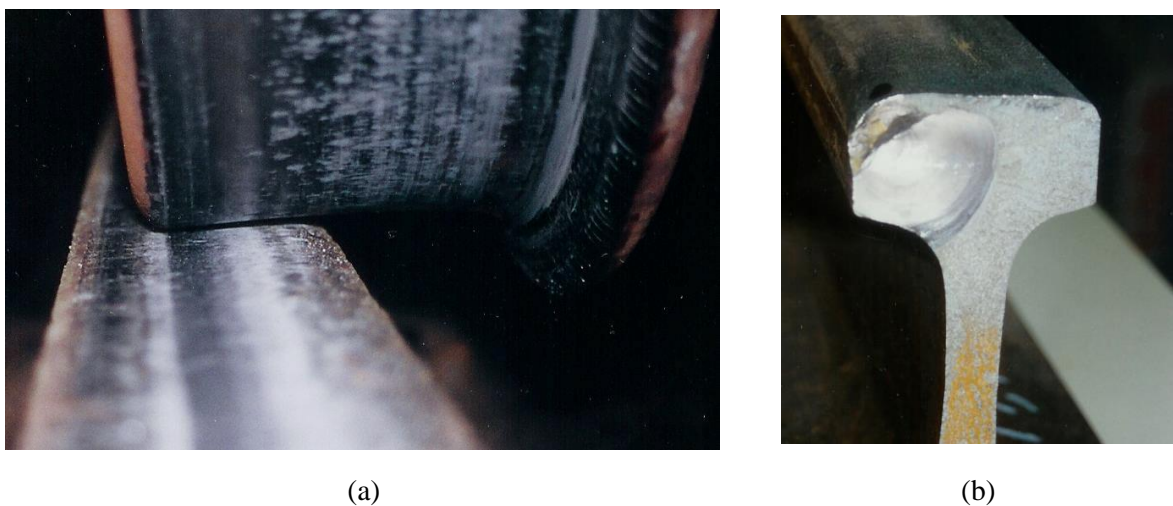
Fatigue cracks on rails (Magel et al., 2004): (a) rail-wheel contact and (b) fatigue crack.
